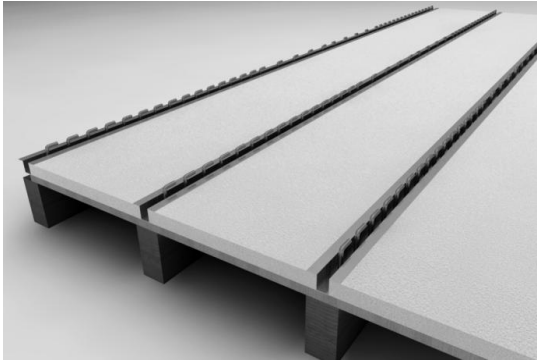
Render of the timber-steel composite beams with the insulated layer placed aside of the steel profiles and over the wooden plank
